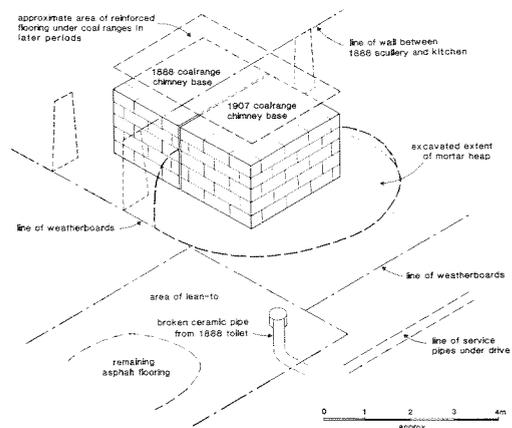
Isometric drawing of the eastern corner of the house, showing details of the under-floor area of the lean-to-scullery-kitchen.
